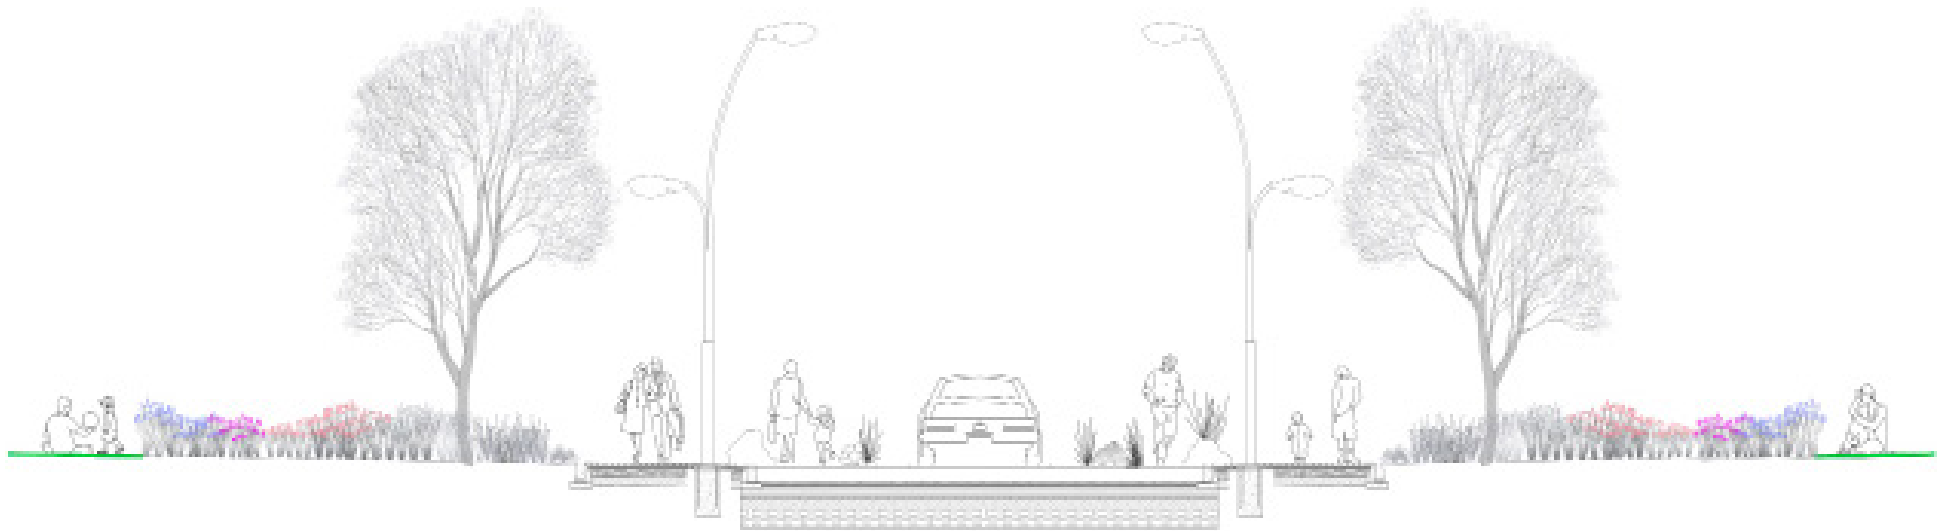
Proposed women's memorial route sections (Author 2021)
